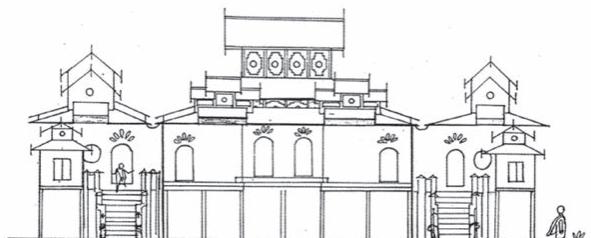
East Elevation of Shwe-Yan-Pyay Kyaung^{*17}
